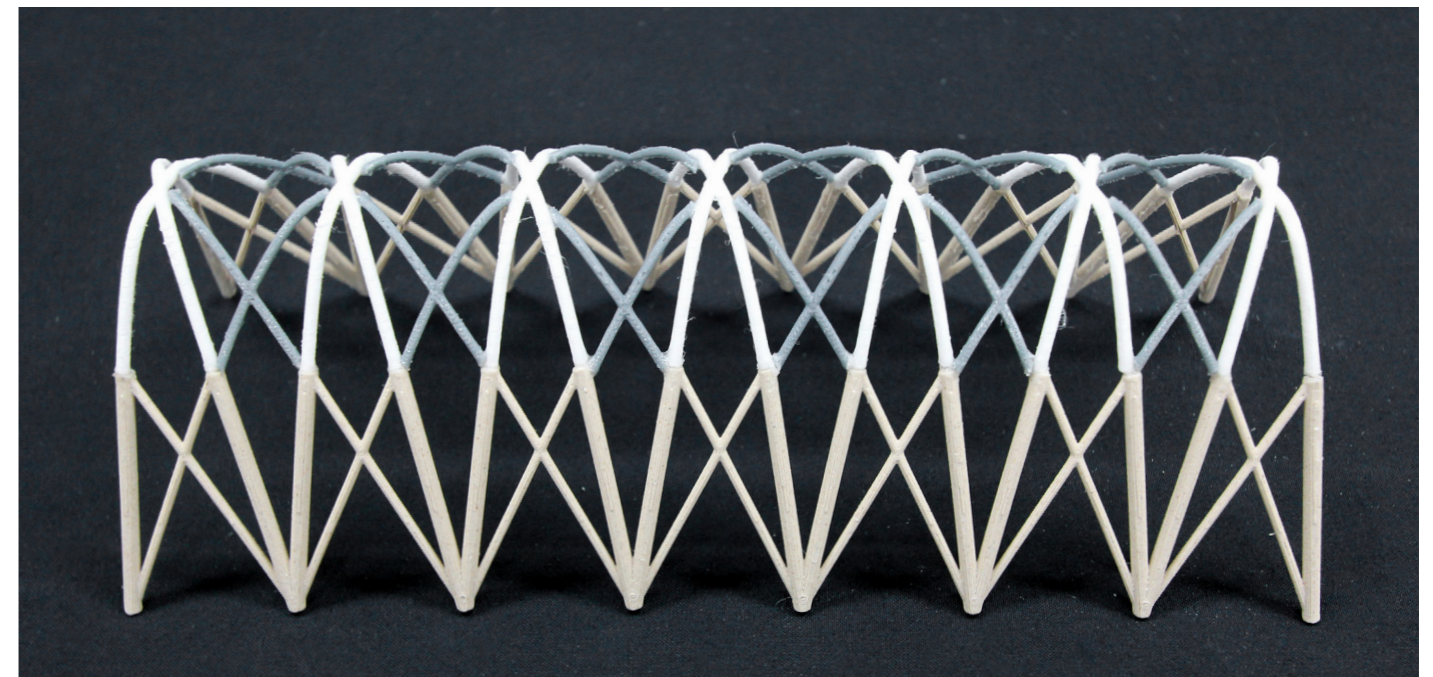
Prototype 1. 3D printed model in 1:100 scale.
